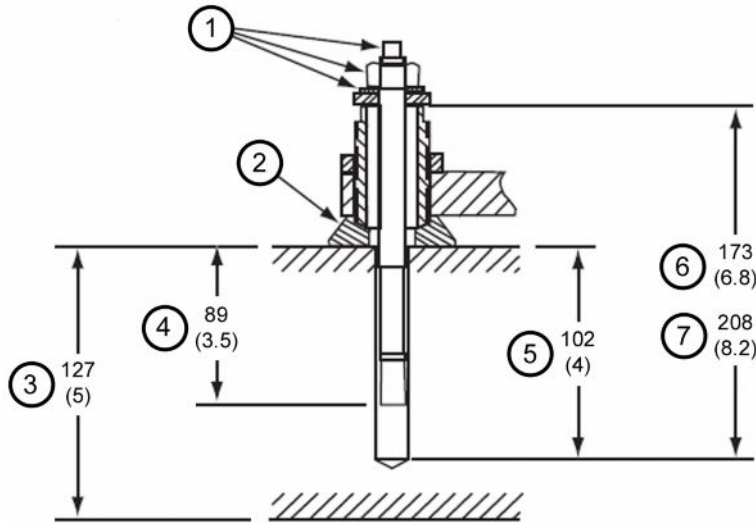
Floor Mounting Detail (Weldment Gantry with Detachable Base)
